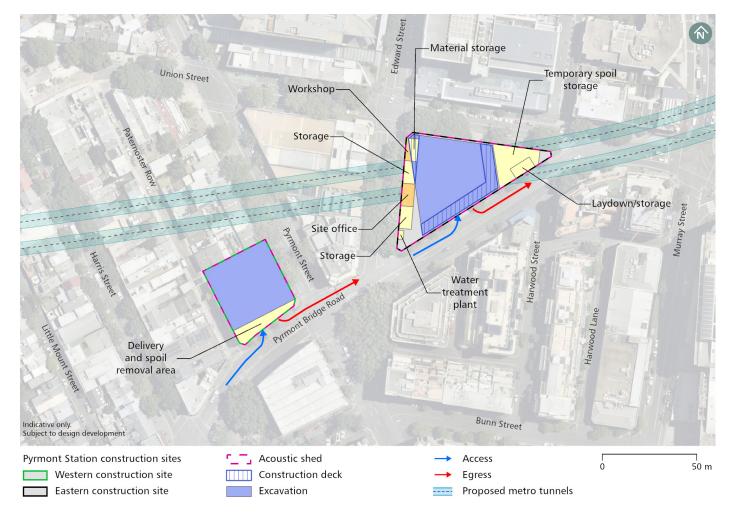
PYRMONT STATION CONSTRUCTION SITE LAYOUT
